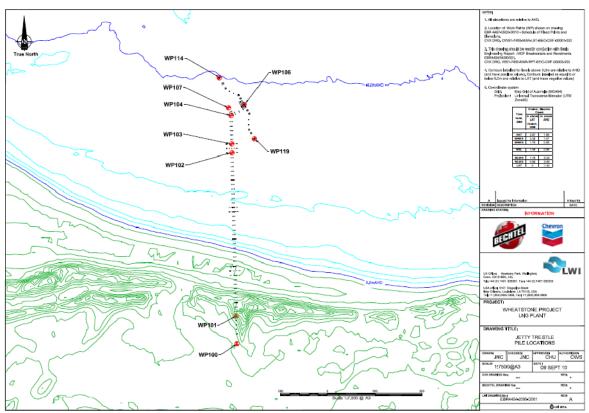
Locations of Work Points (WP) in the proposed Wheatstone port facility development.
